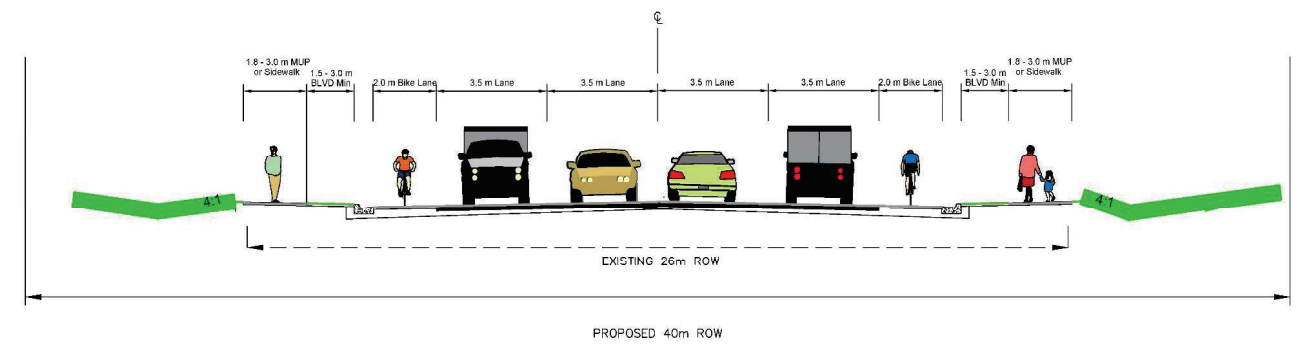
Section 1 Alternative 3 - 4-Lane Urban Cross Section
